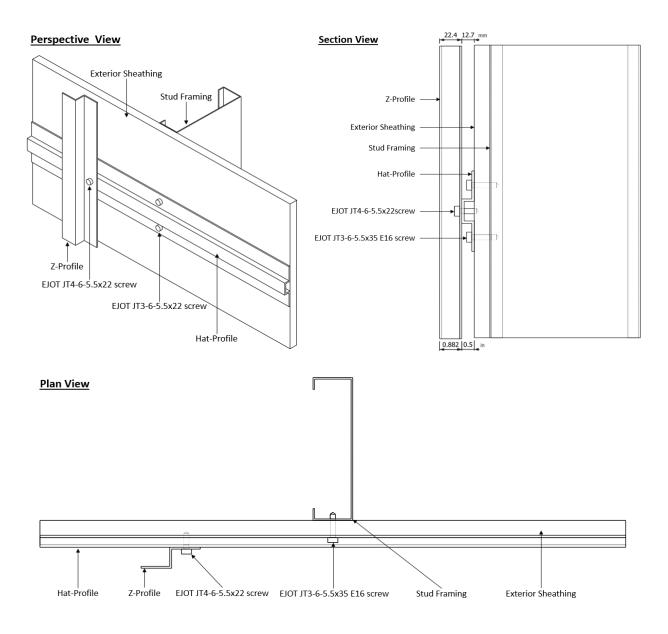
CEMBRIT FIBER-CEMENT FAÇADE PANEL SYSTEM
